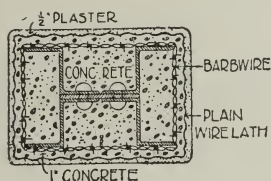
Concrete Covering for Column. Hinchman-Renton System.
